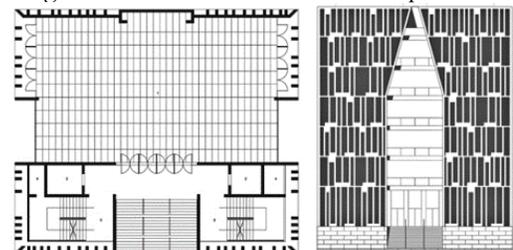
Typical Floor Plan, East Elevation of Gulshan Society Central Mosque
